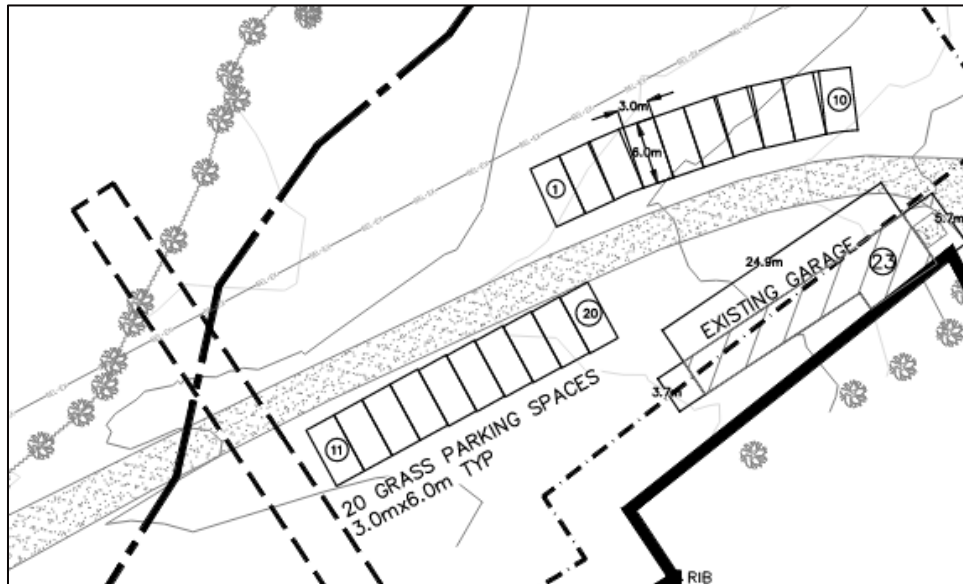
Proposed Parking Area Site Plan Existing – 2 (Greer Galloway)
